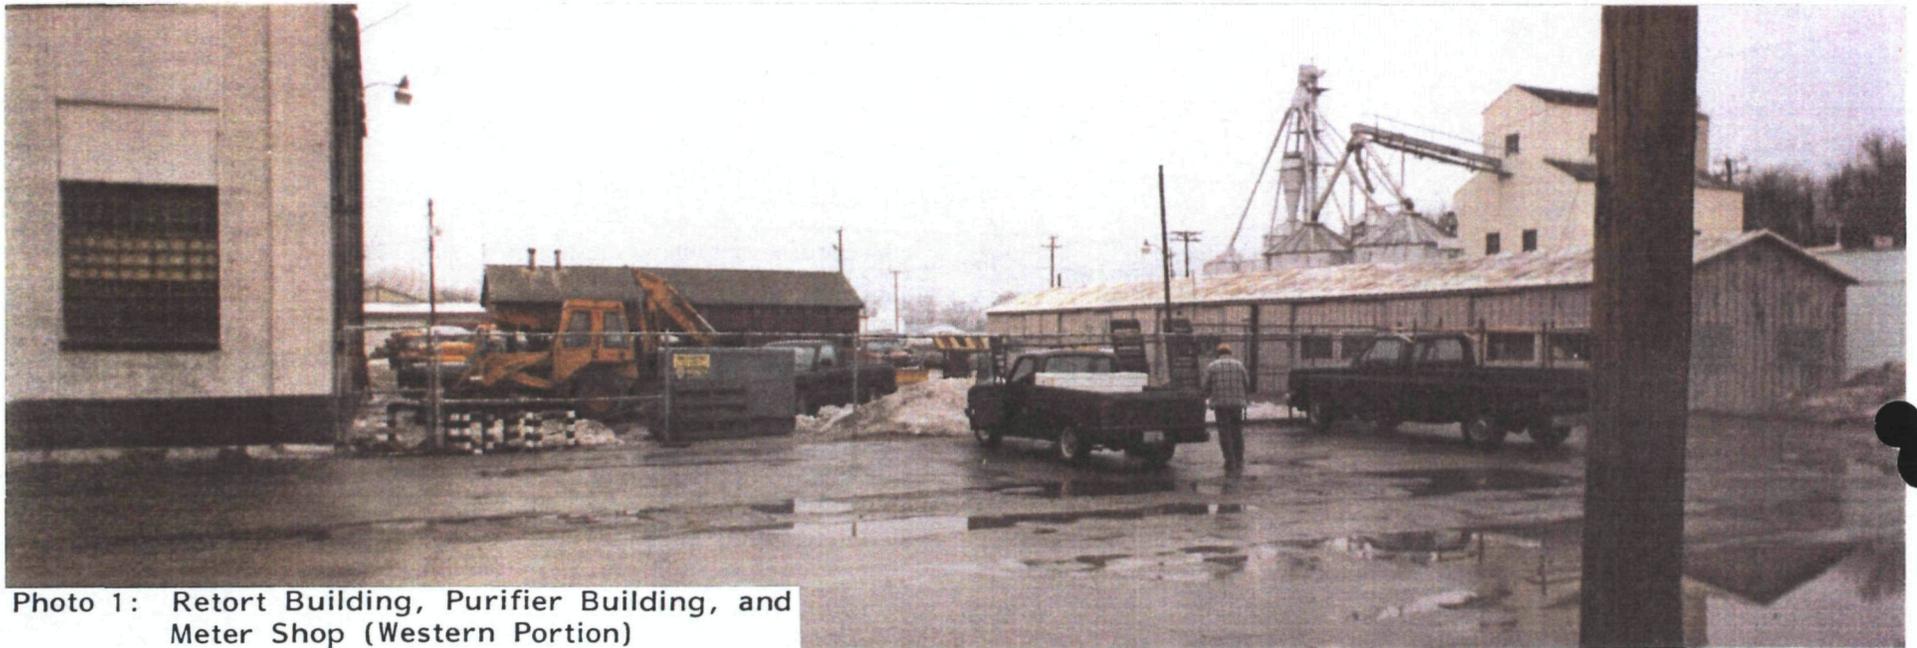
Retort Building, Purifier Building, and Meter Shop (Western Portion)
